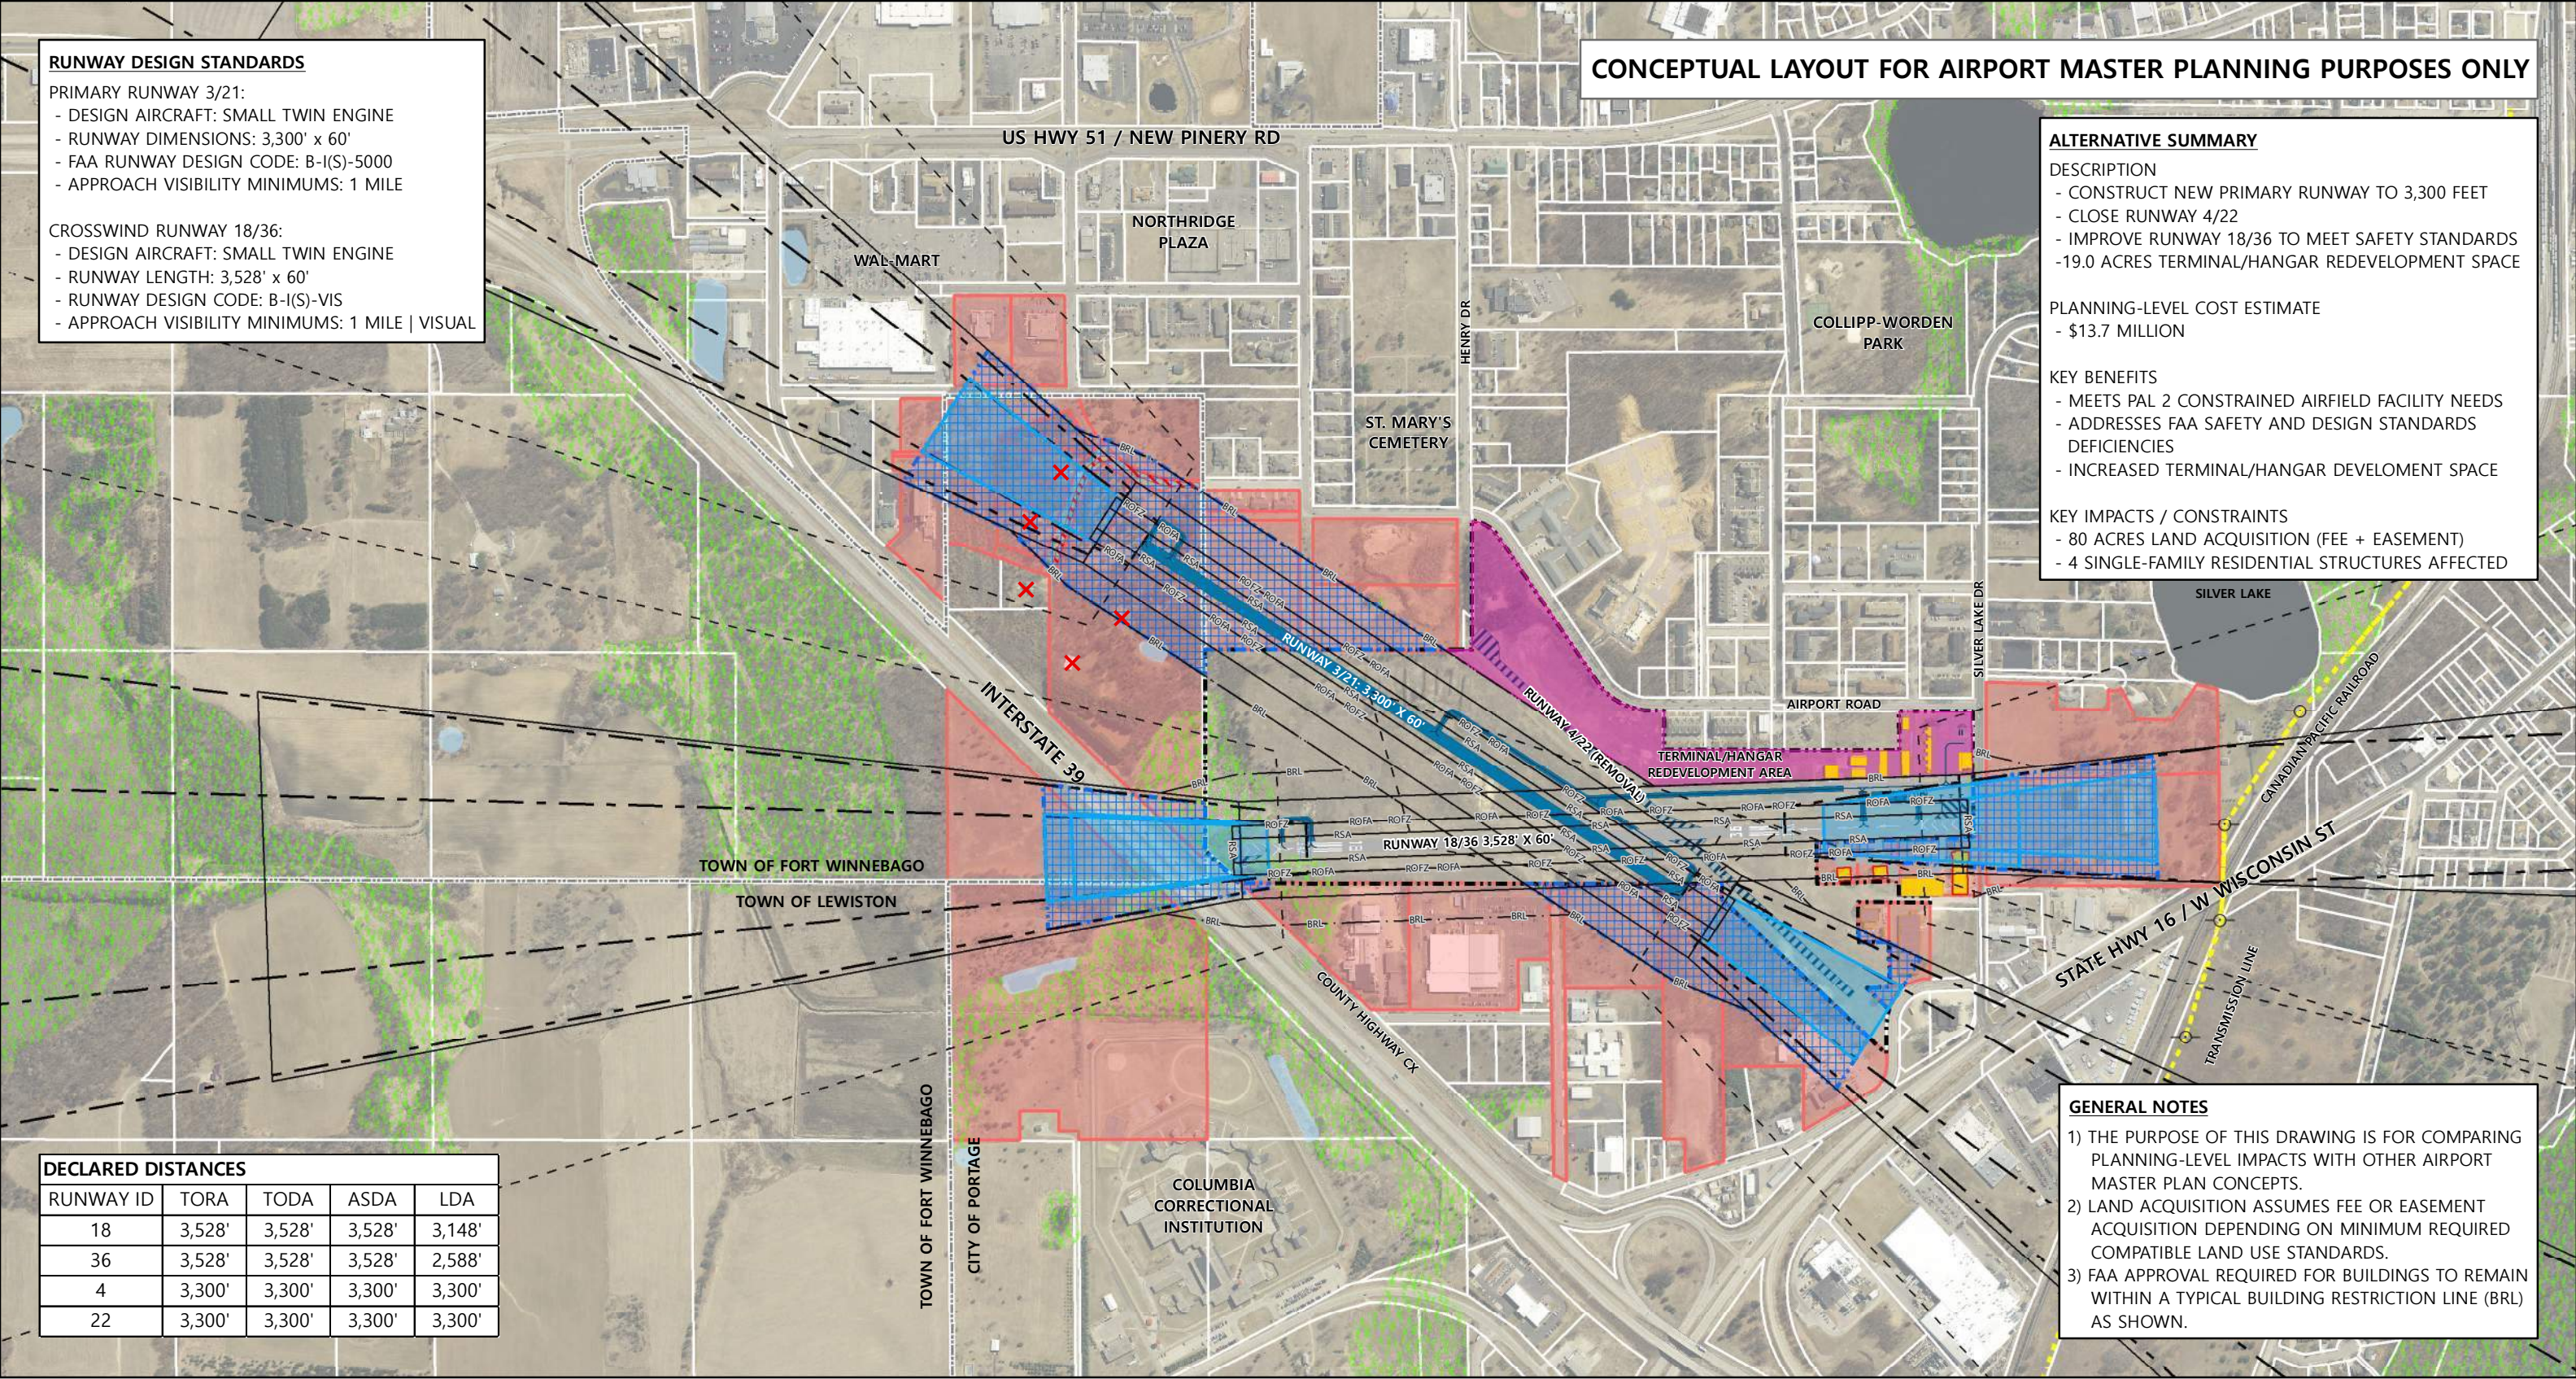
ALTERNATIVE 2C - CONSTRUCT NEW RUNWAY TO 3,300 FEET (REVISED)
